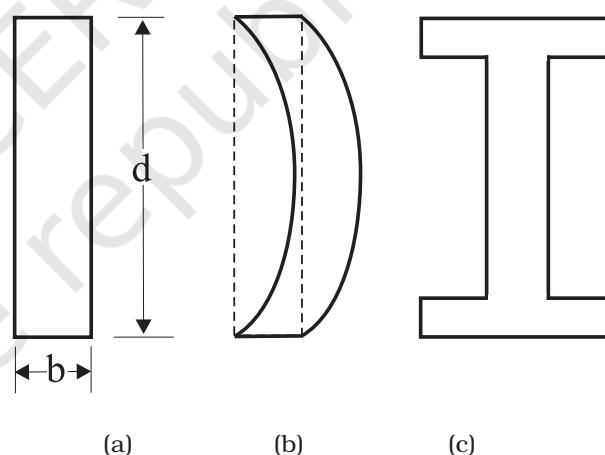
Different cross-sectional shapes of a beam. (a) Rectangular section of a bar; (b) A thin bar and how it can buckle; (c) Commonly used section for a load bearing bar.
